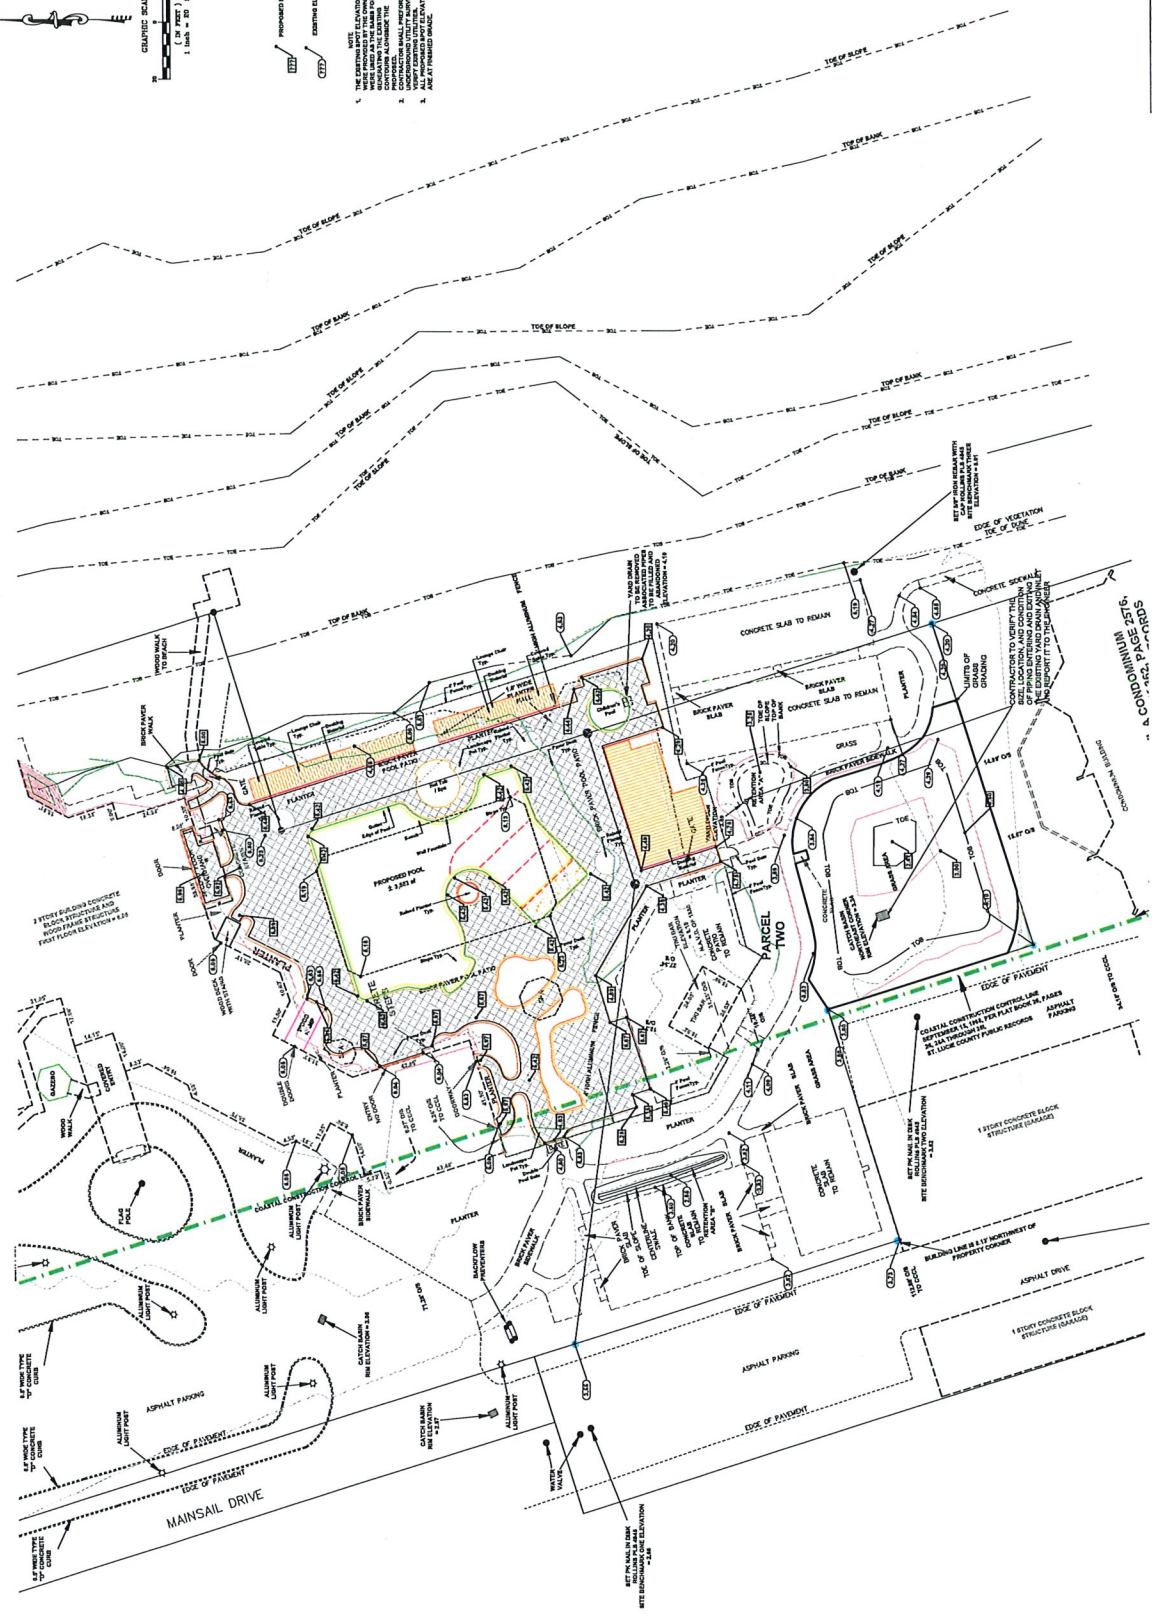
DRAINAGE PLAN, PAGES 1 & 2
